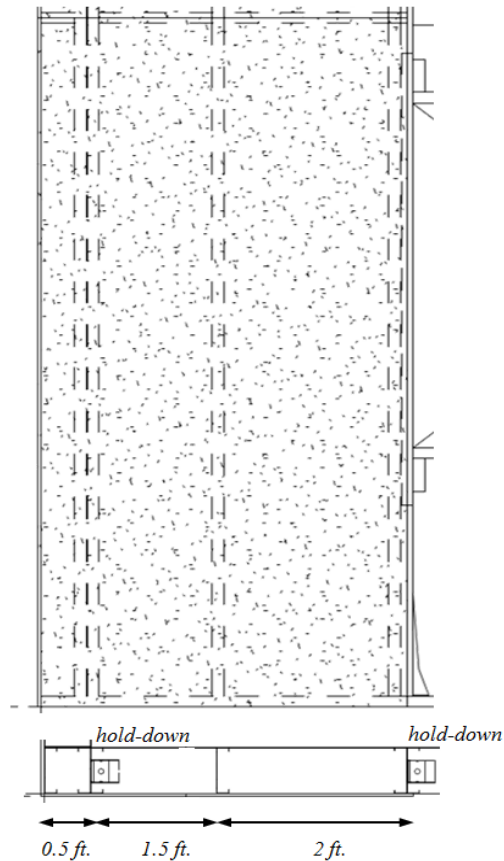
The elevation and plan view of a 4 ft. x 9 ft. wall of a two-story steel building (Madsen et al., 2011).
